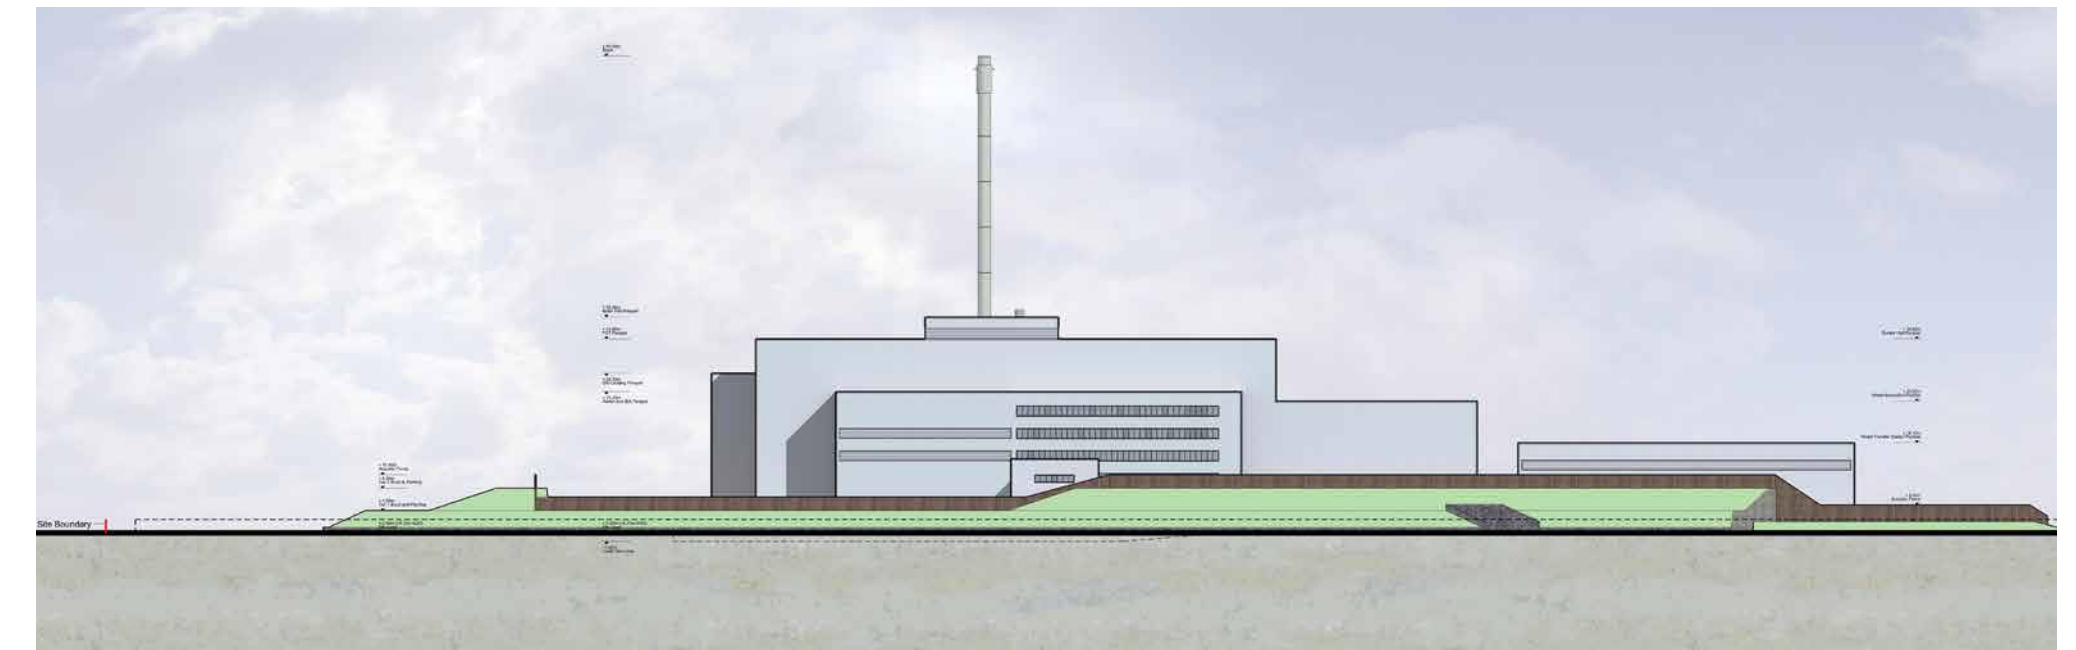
Proposed west site elevation – extract from drawing PL313
